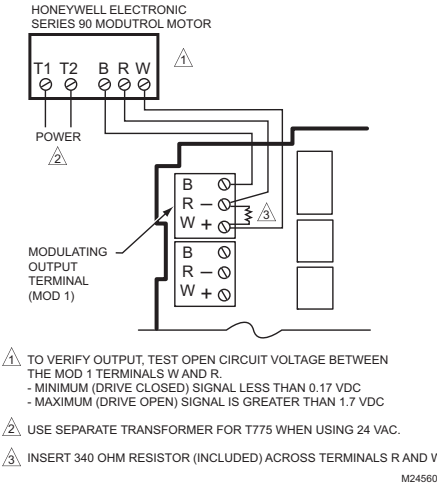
Wiring for Series 90 Modutrol Motor Control.
